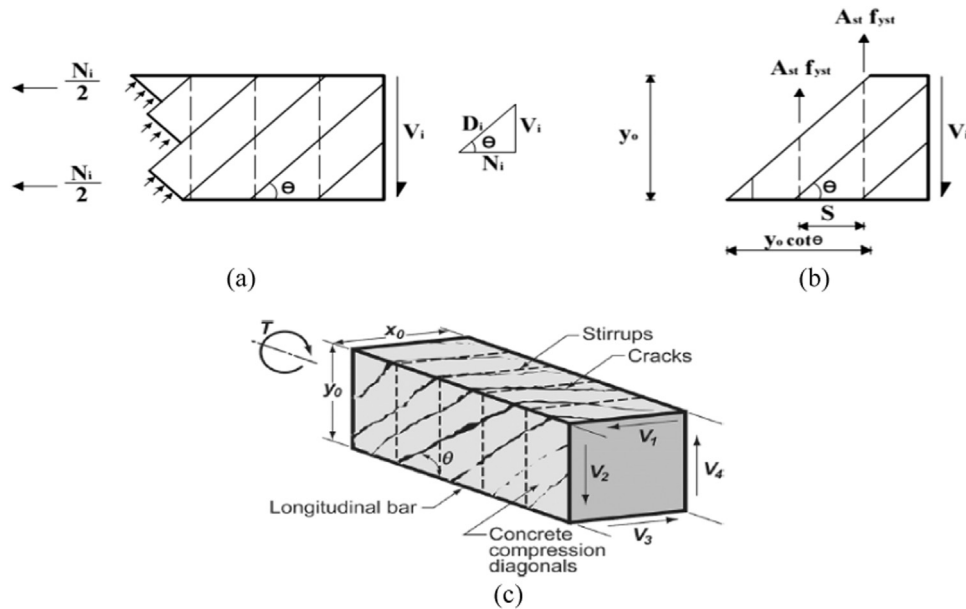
Space truss model (a) Resolution of shear force V_i into diagonal compression force D_i and axial tension force N_i (b) force in the stirrups (C) components of idealized space truss model [23].
